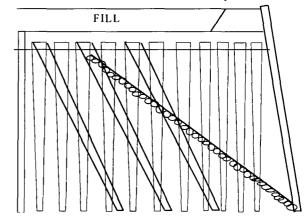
Timber Pile Relieving Platform, East River Drive, New York, NY
